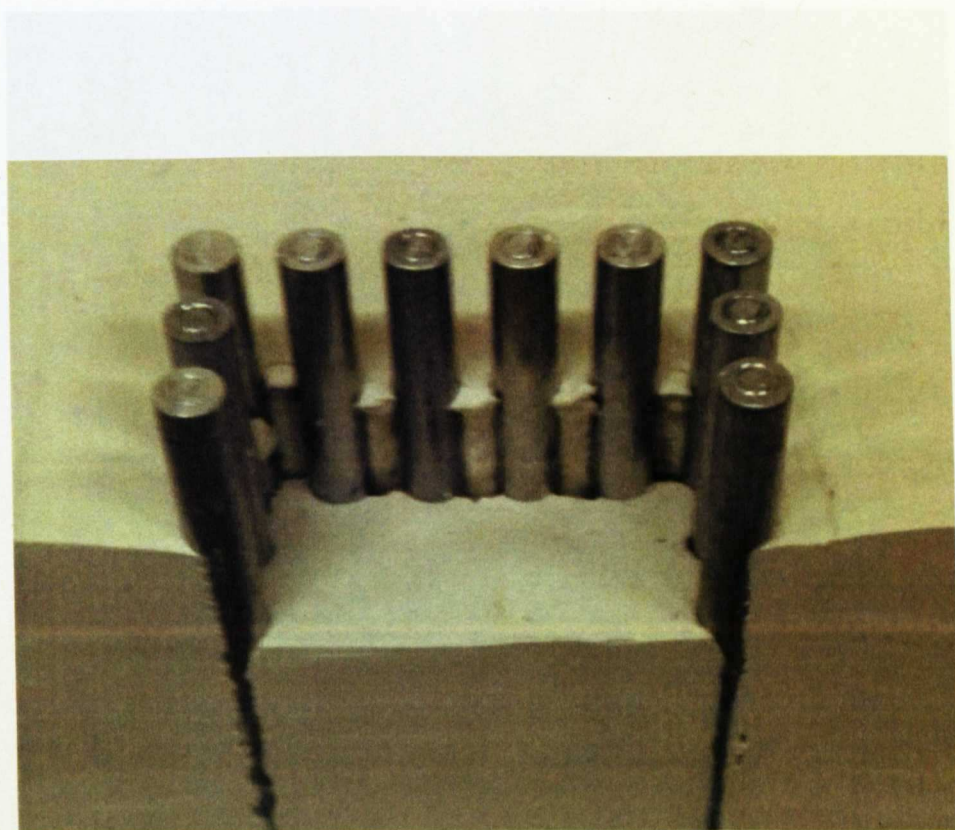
Cross sectional view of PS20\_1.50 showing shear surface (test 5c)
